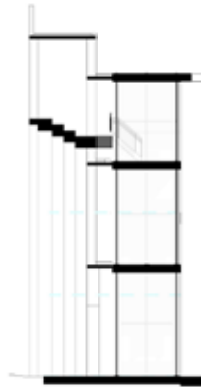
LAKSHMI BUILDING - SECTION D - Scale 1:500.
